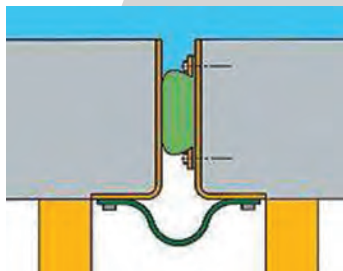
Installation. The tunnel element is lowered to its final place on the foundation at the bottom of the dredged trench. The new element is placed against the previous element under water. Water is then pumped out of the space between the bulkheads and a permanent seal/gasket is installed.
